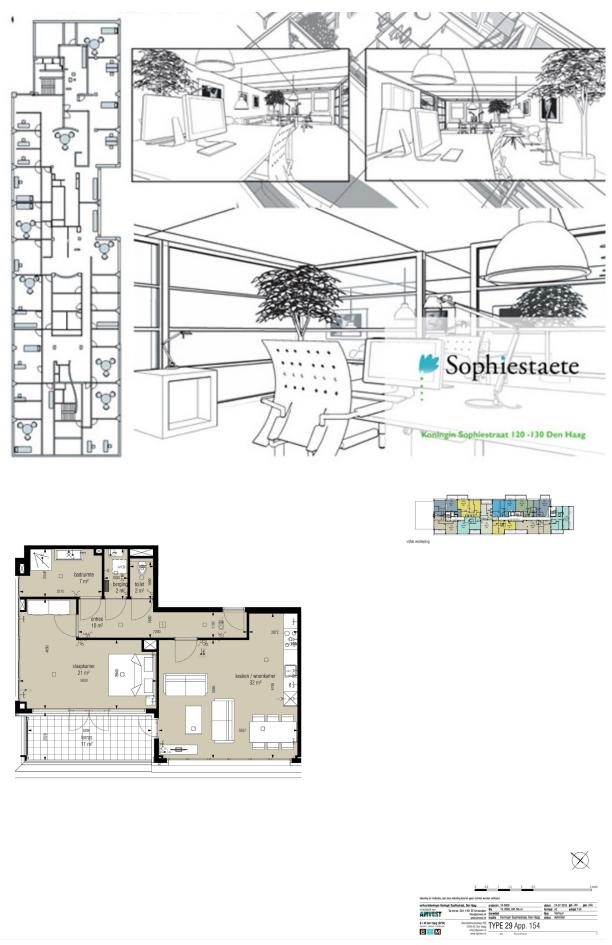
Floor plans before and after transformation (MVGM; IkWilHuren.nl; Building Concept)
